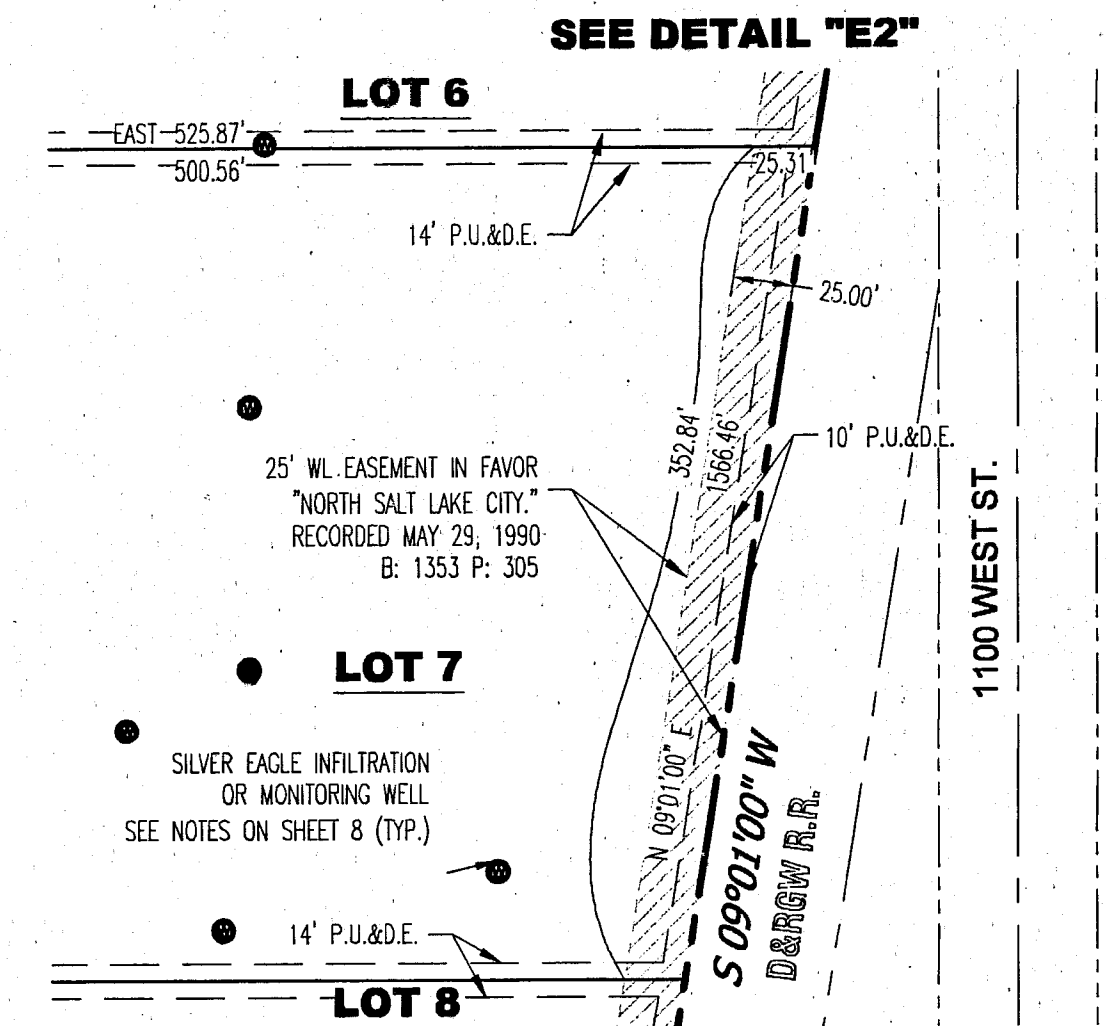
" (UNITED STATES OF AMERICA & UTAH POWER & LIGHT)
